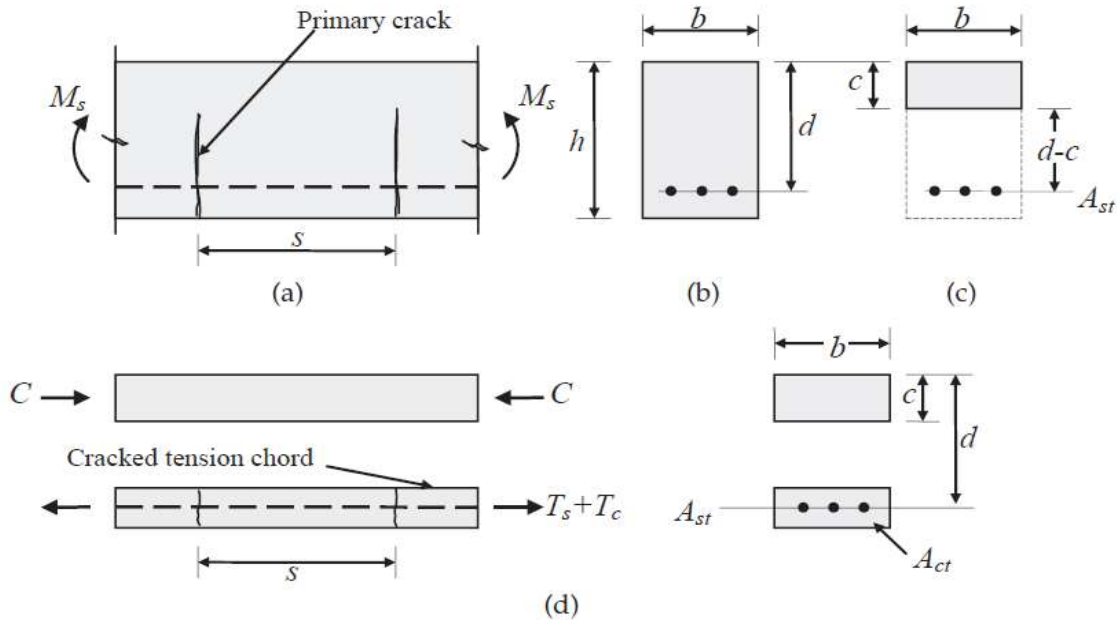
Cracked beam model – (a) beam elevation, (b) uncracked section, (c) cracked section, and (d) idealized compression and tension chord model (Gilbert, 2009)
